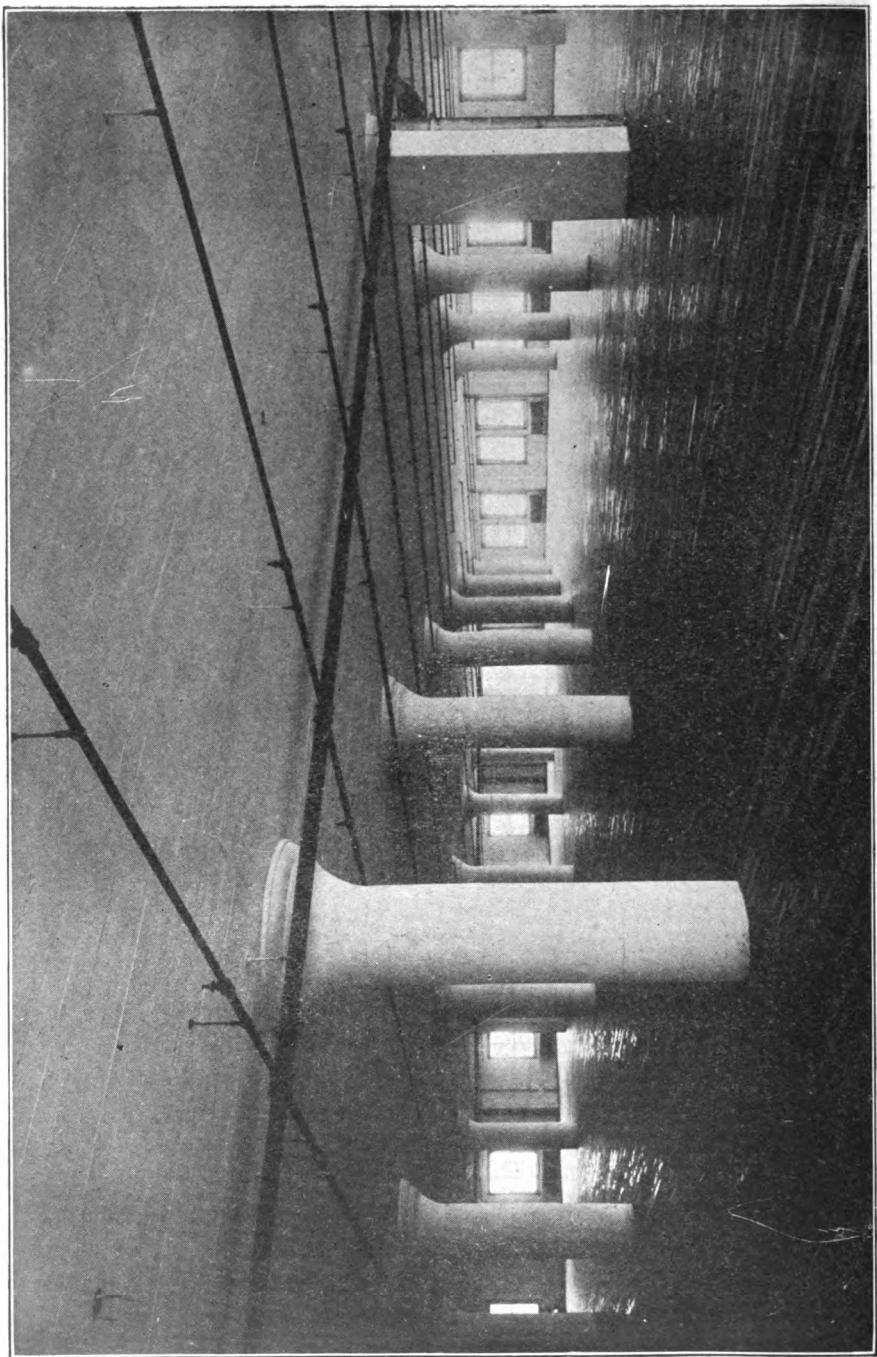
Reinforced Concrete Warehouse Showing Turner's Mushroom System
